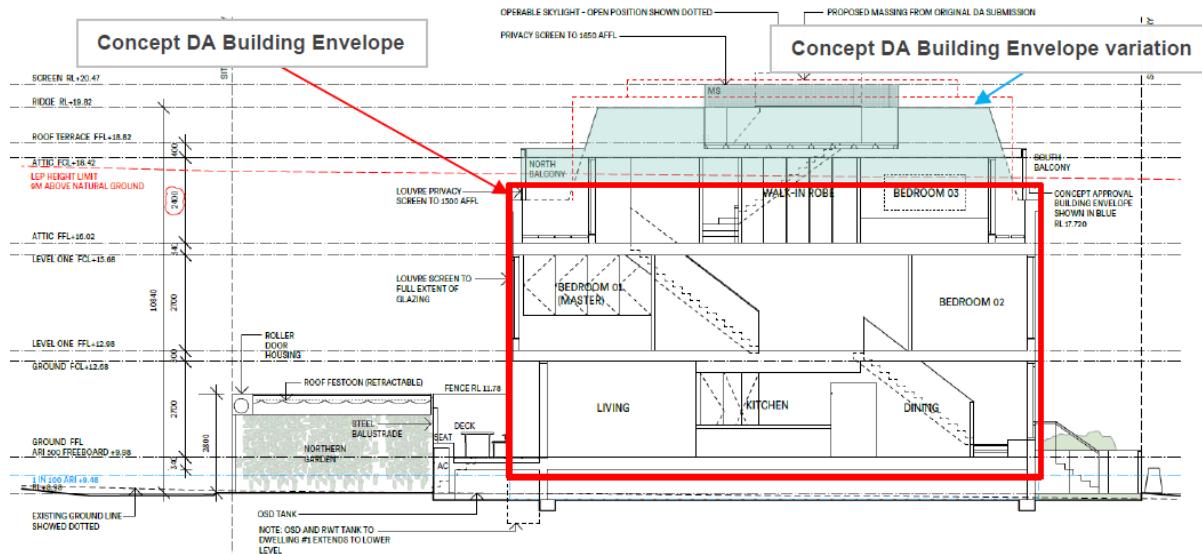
A section plan highlighting the approved building envelope in red with the portion of the building exceeding the envelope in light blue.
